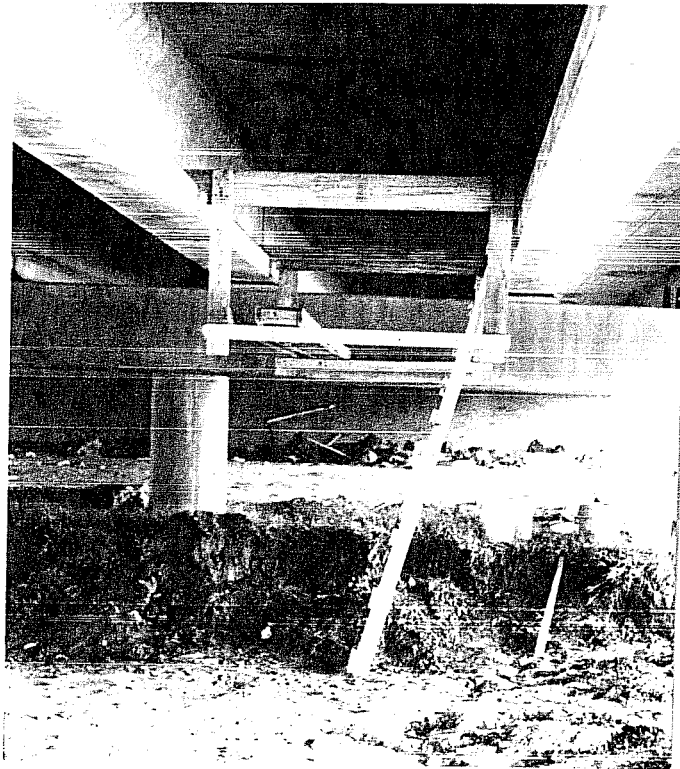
Platform used to reach bottom surface of slab at east end of bridge for instrumentation application
